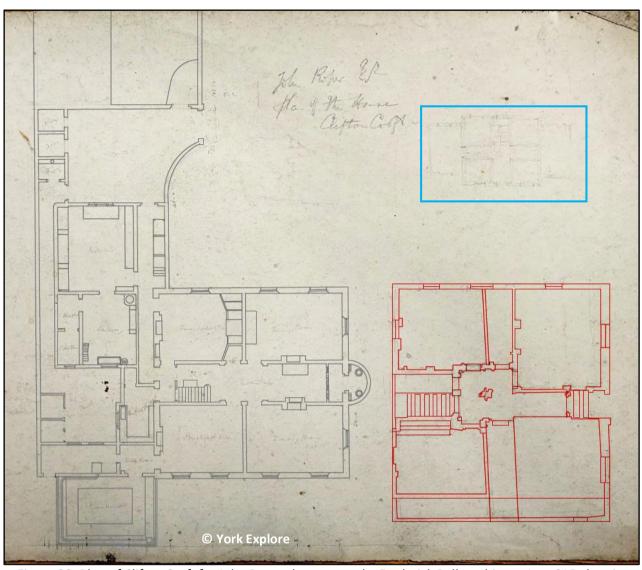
Plan of Clifton Croft for John Roper the younger by Frederick Bell, architect. AutoCAD drawing over the original plans for readability. The possible older building is highlighted in red alongside an additional sketch, outlined in blue (CYA FBE/1/21).
